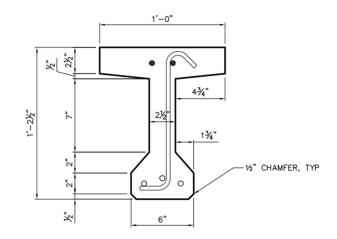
TYPICAL BEAM CROSS-SECTION
